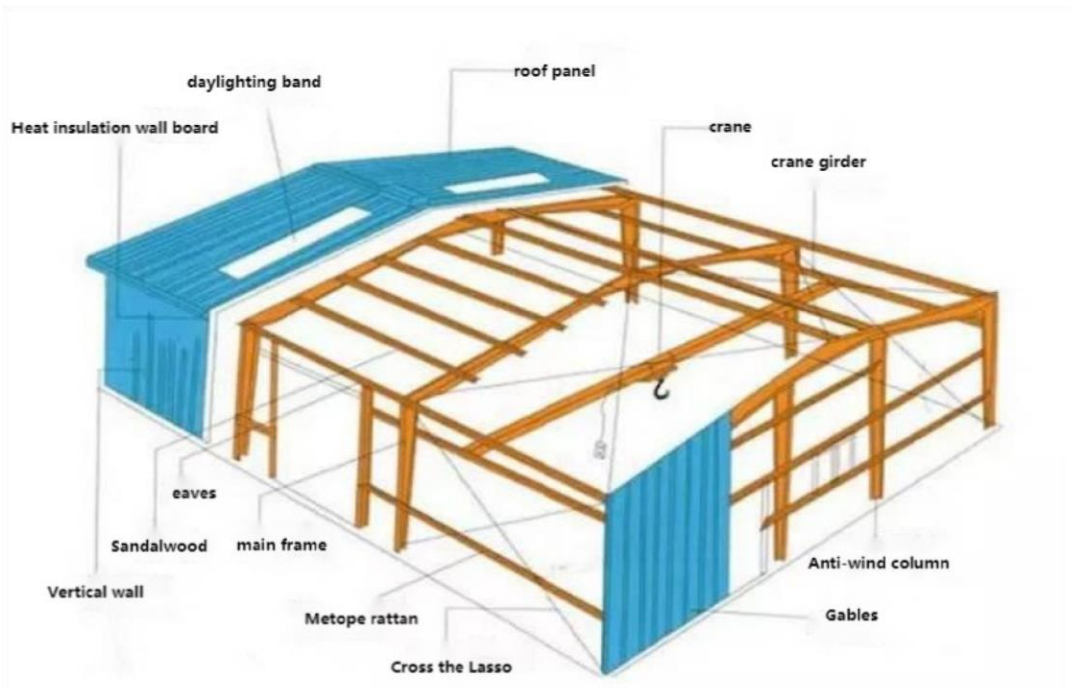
Construction technology of light steel structure roof purlin of portal steel frame
